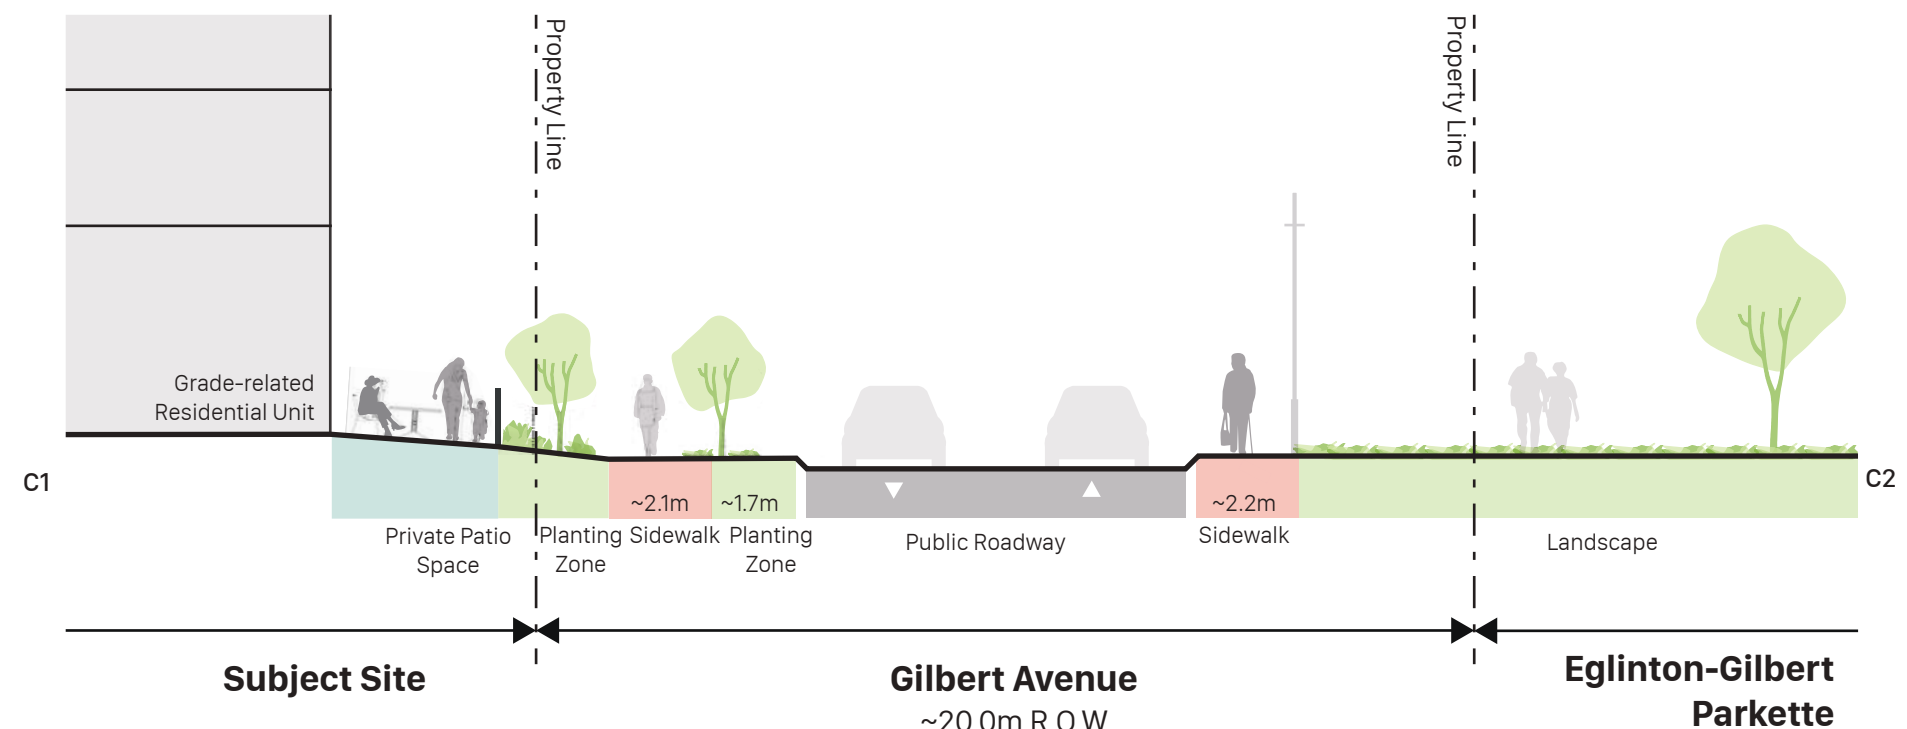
Section C1-C2 Gilbert Avenue (Proposed)
